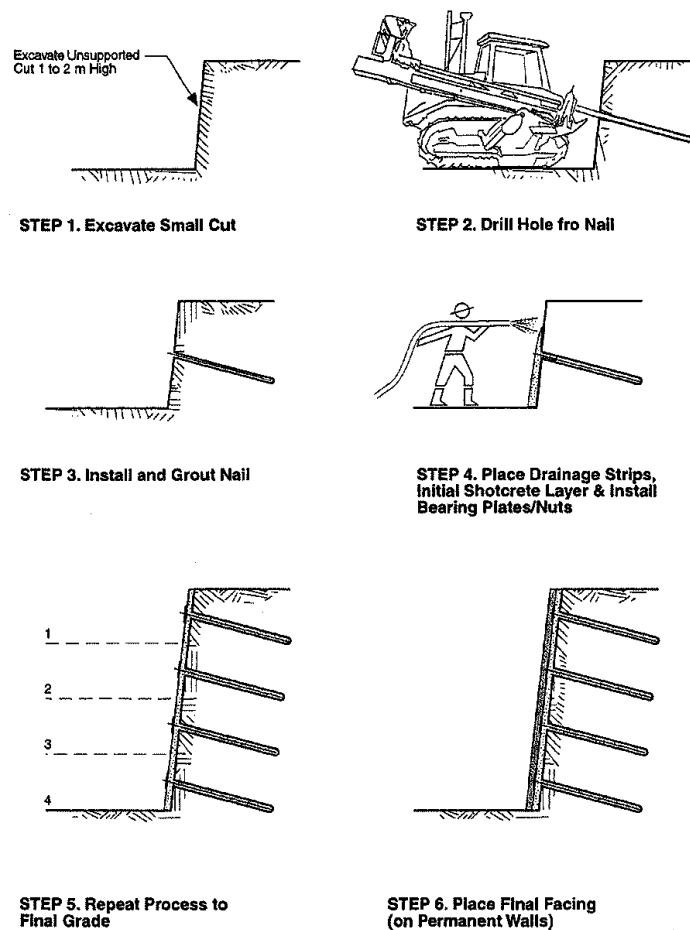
Typical nail wall construction sequence (Byrne et al. 1998)
